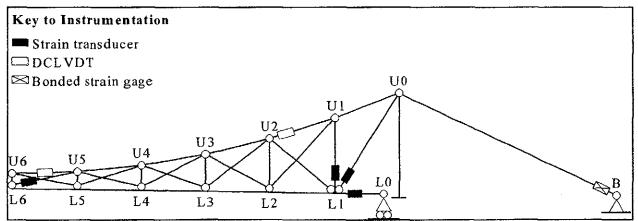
Locations of strain-measuring devices on upstream (east) truss of Lower Bridge at English Center.
